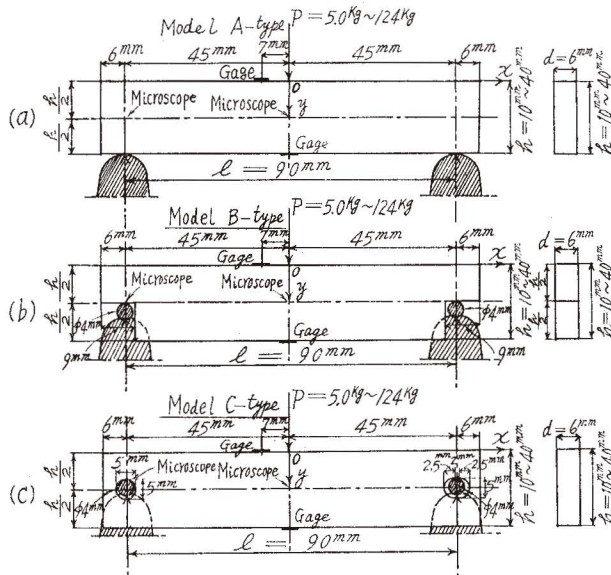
Dimension Details Connected with the Supported Constructions, the Loading Point and Cross Sections of Some Simple Beam Models Constructed of Epoxy Resin.
